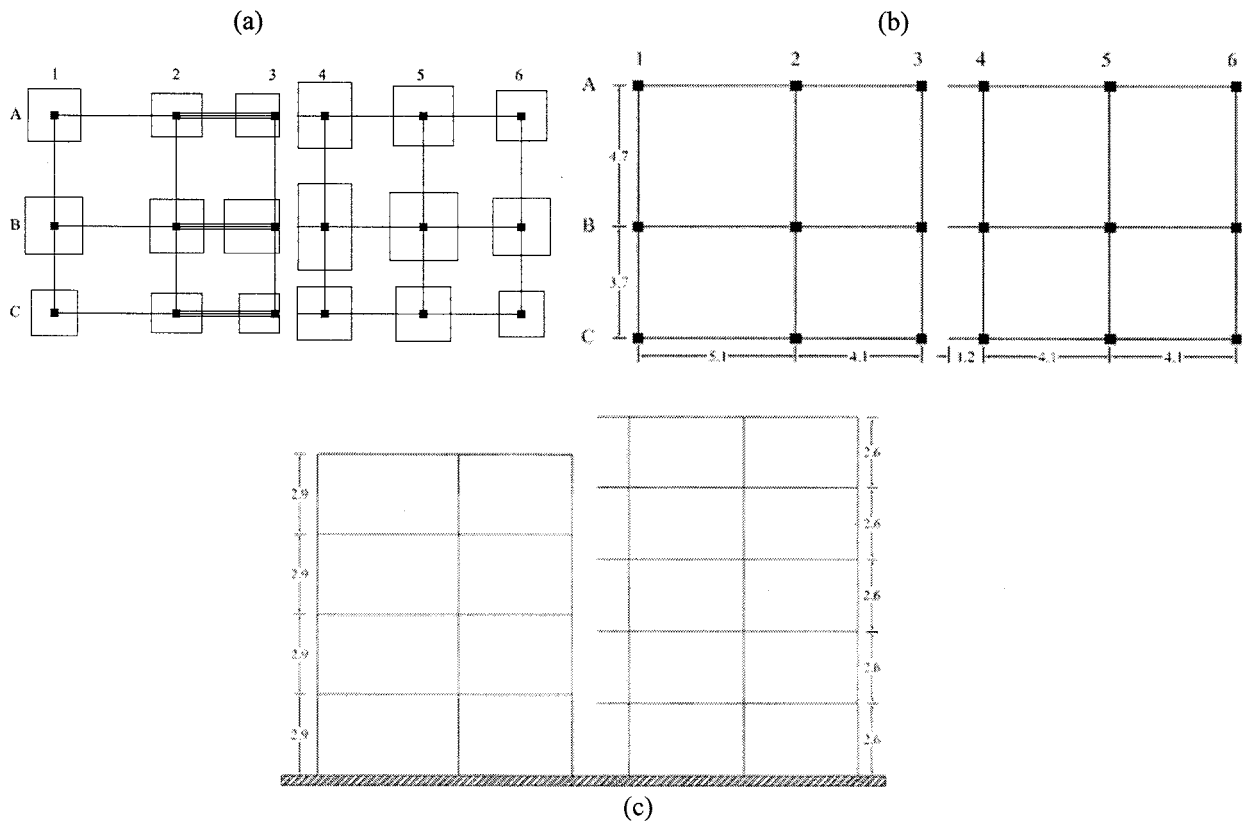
(a) Foundation of Buildings, (b) Plan and (c) Elevation
